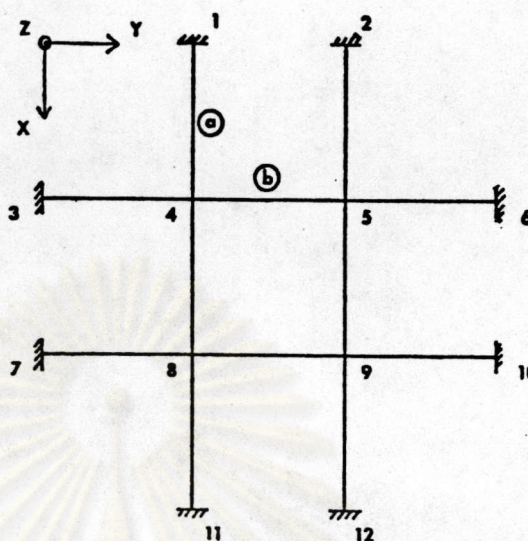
Cable net at plan view, EXAMPLE PROBLEM 3
